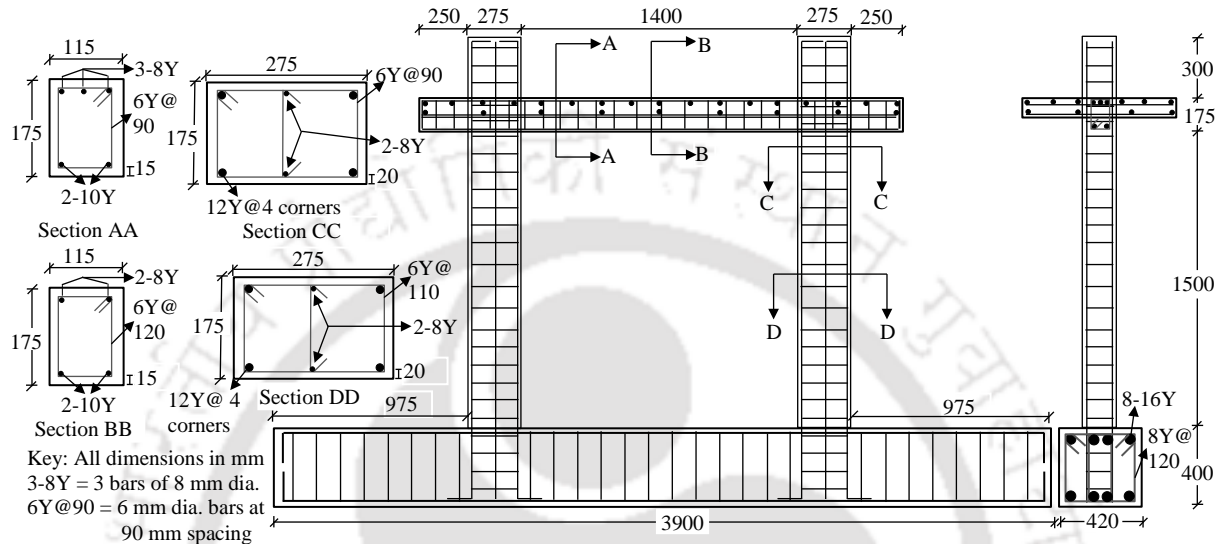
Reinforcement detailing of infilled frame with enhanced column section (IF-EC).
